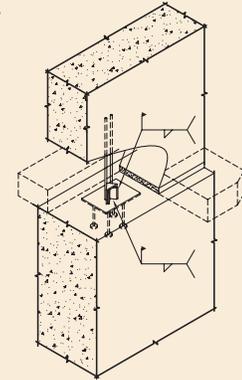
Bearing wall to foundation (BWF5).
